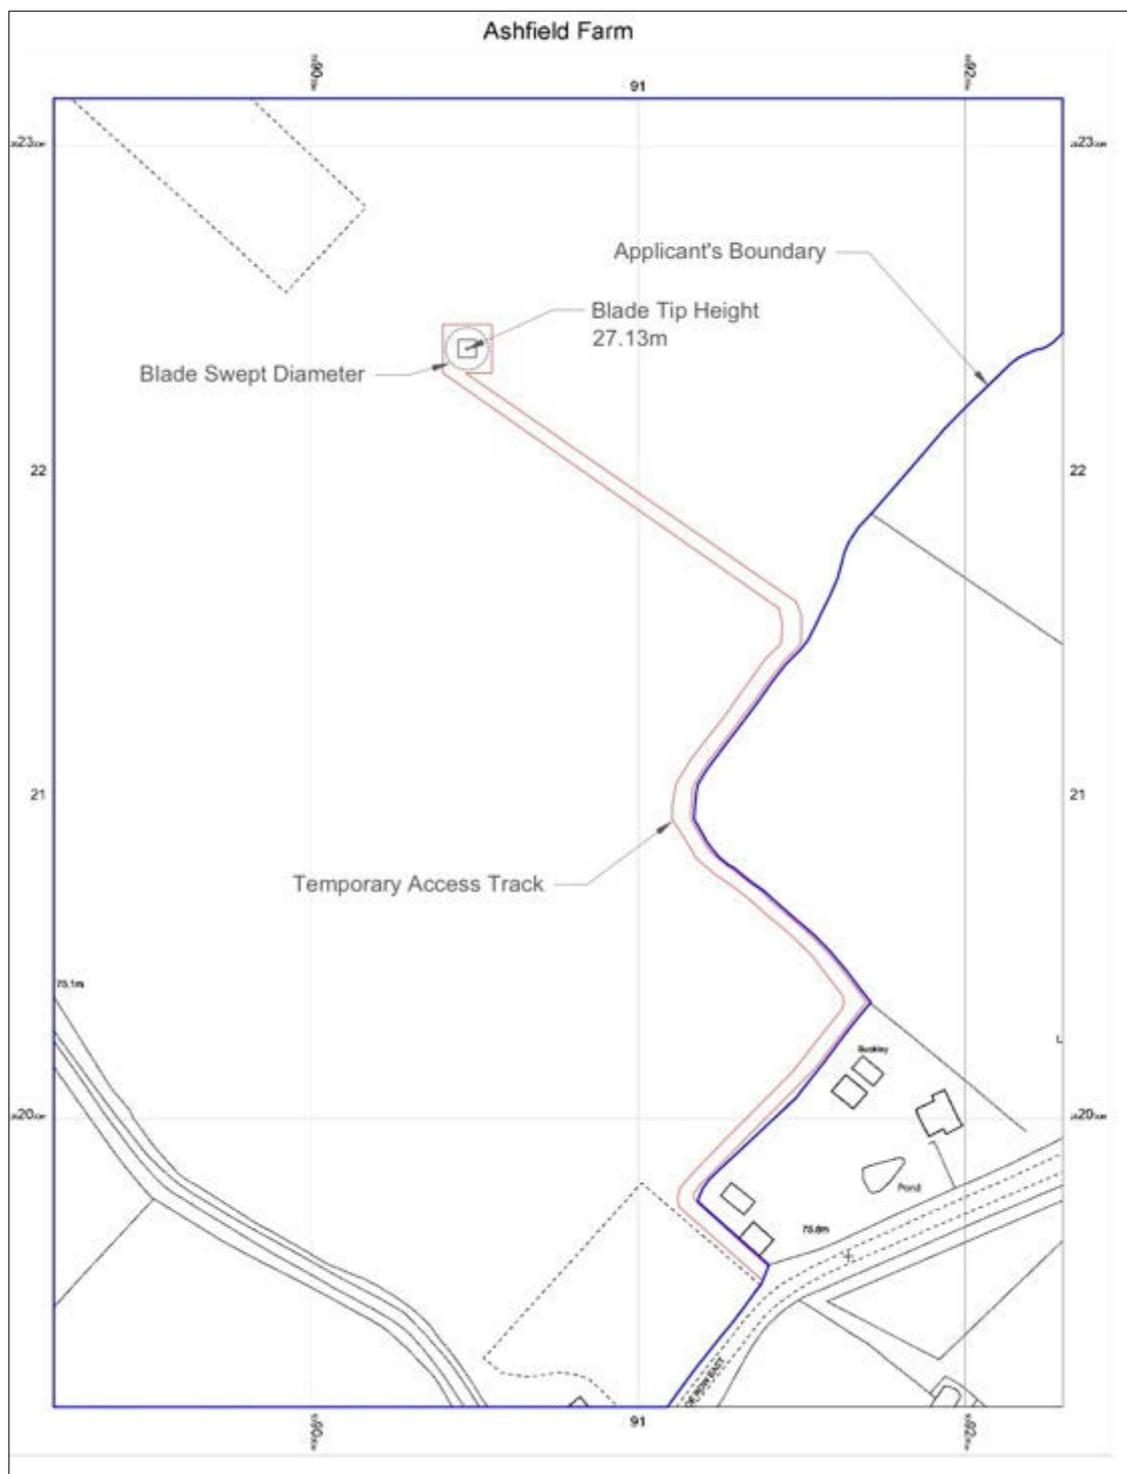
; Site location plan for Ashfield Farm proposed Wind Turbine
